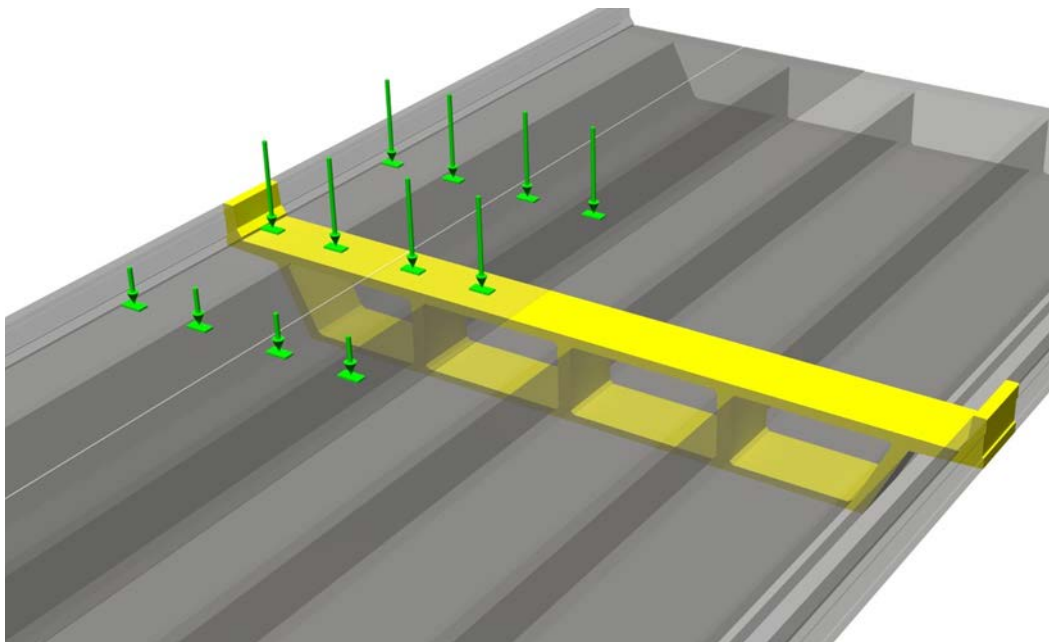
Transverse Strip subjected to two Design Trucks as per Figure 8.3
